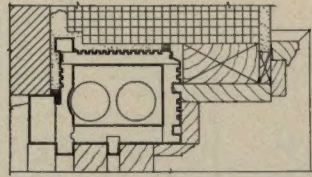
13-inch brick and tile wall with inside reveal and narrow trim. Note position of anchor strip to give regular 5 1/4-inch jamb width.
